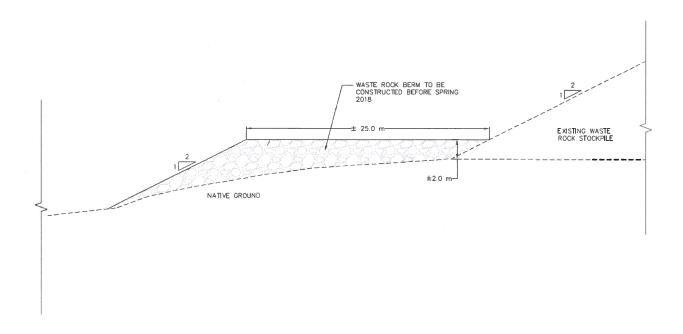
Conceptual Detail of Pile Toe Berm (constructed with Non-PAG)
